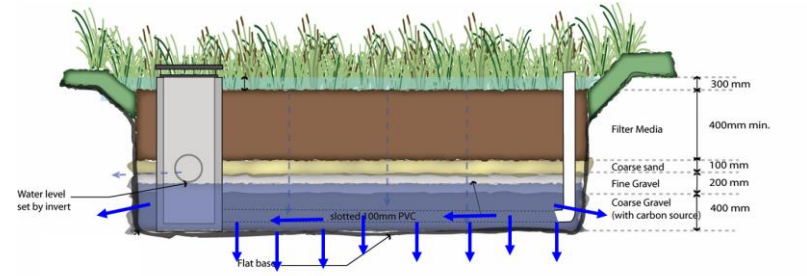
Bioretention with underdrainage, infiltration and submerged zone
